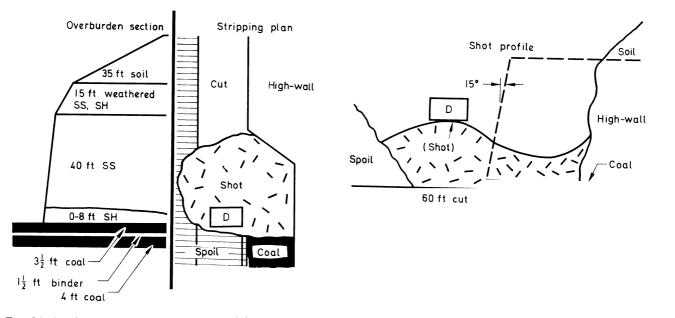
Overburden casting with explosives.⁽²⁴⁾ Plan and profile of a typical application of explosives to overburden casting shows a minimum of material to be handled by excavating machines.
